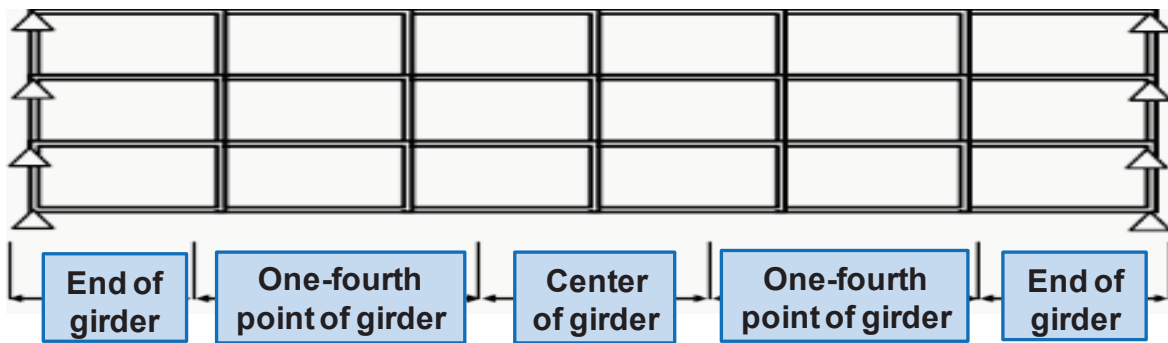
Subdivision of plate girder for damage identification
